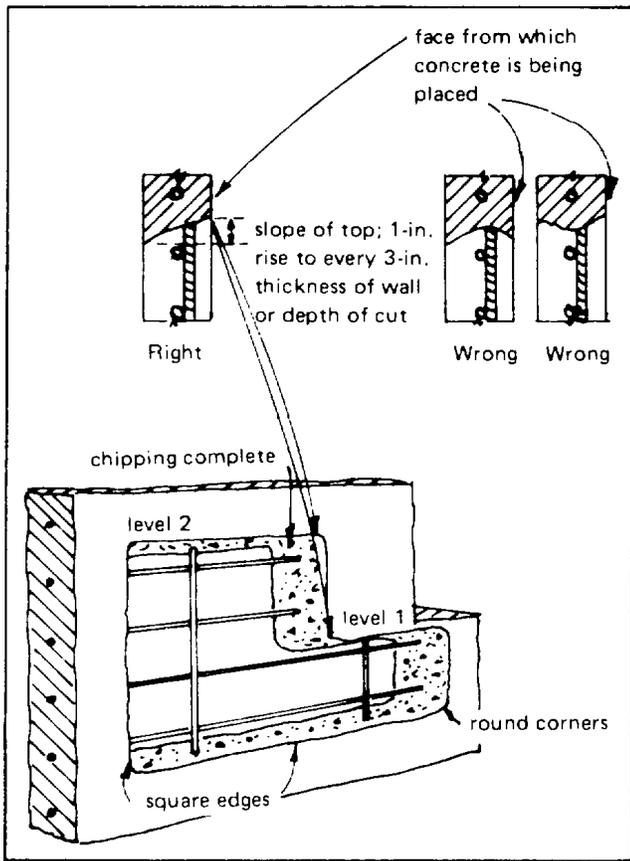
Excavation of irregular area of defective concrete where top of hole is cut at two levels.
